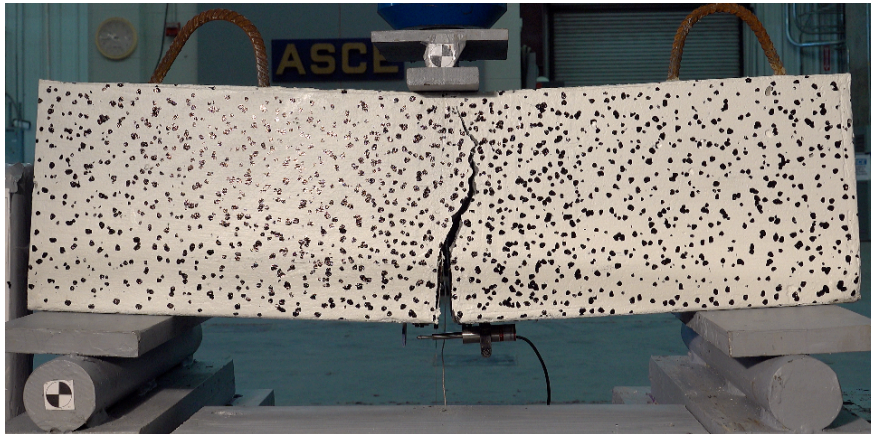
Three-foot epoxy-repaired unreinforced concrete beam behavior.
